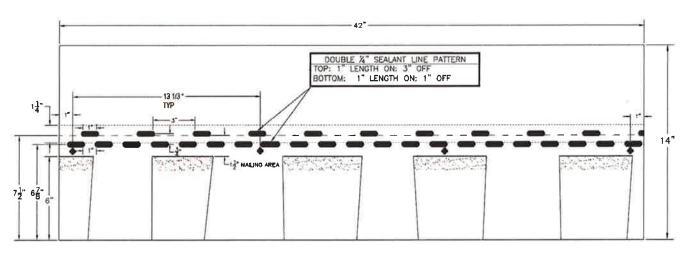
Pinnacle® Pristine and StormMaster® Shake 4 Nail Pattern (Non-HVHZ only)
